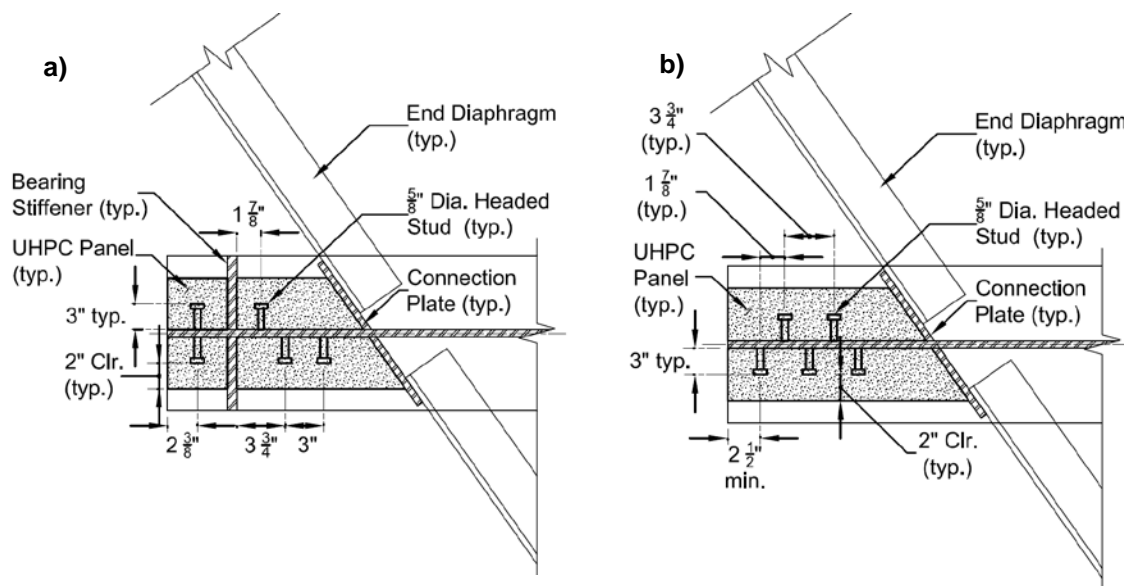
Sample stud layouts for beam ends a) with bearing stiffeners and b) without bearing stiffeners.
